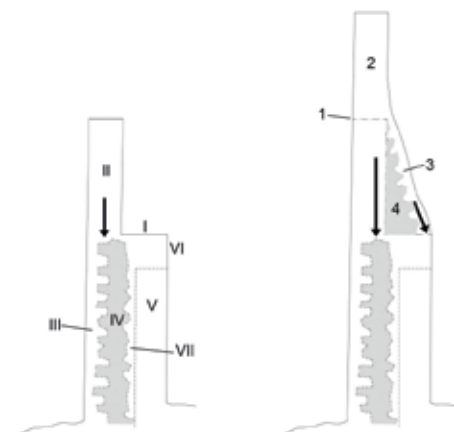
Simplified sections of the land wall. The section to the left show the land wall before it was heightened and the section to the right shows it after the heightening and how it is today. The arrows show the eccentric loading of the outer leaf and the thrusting force from the bottle neck shape. I) Rampart walk. II) Parapet. III) Outer masonry leaf. IV) Core with clay mortar and no bond. V) Openings of inside arches. VI) Top of inside arches. VII) Thin masonry leaf inside arches. 1) The height of the original wall (left image). 2) Heightening of the wall in solid masonry. 3) Masonry leaf of bottle neck shaped masonry. 4) Upper core inside former parapet wall.
